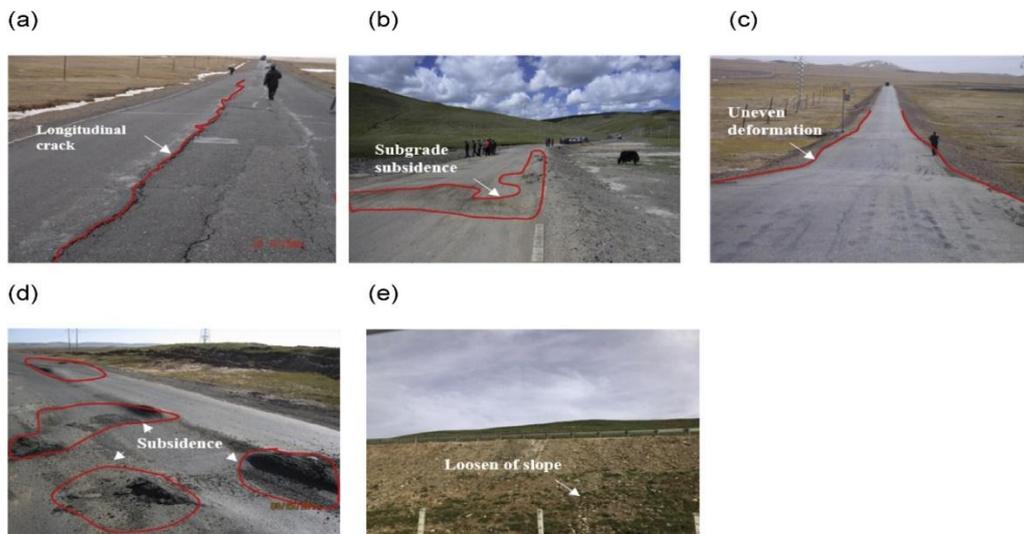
Typical pavement diseases in permafrost regions along the Tibetan Highway (Shaa et al., 2022). (a) Longitudinal cracks. (b) Subgrade subsidence. (c) Uneven deformation. (d) Subsidence caused by frost boil. (e) Slope failure.
